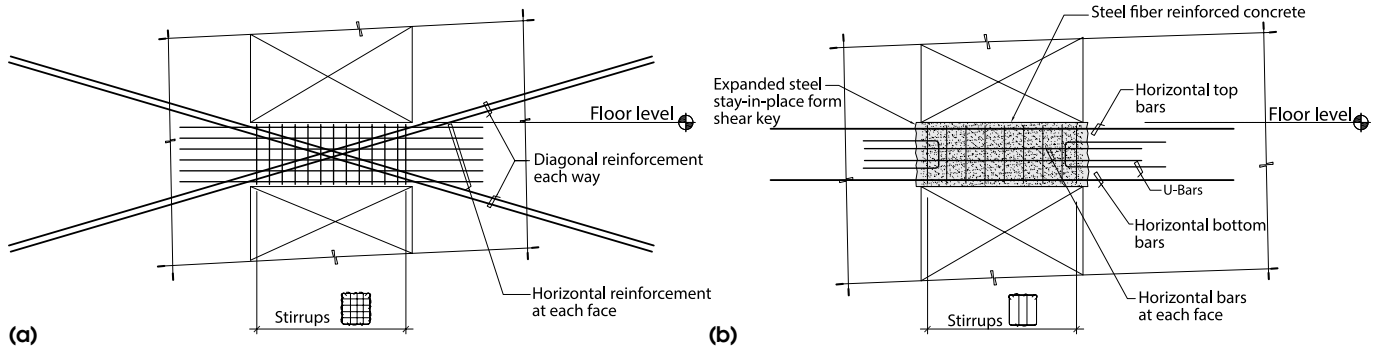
Schematics of link beams: (a) conventional reinforced concrete; and (b) fiber-reinforced concrete. A conventional link beam is typically highly congested and the extensions of the diagonal reinforcing bars will conflict with the adjacent wall reinforcing (yet to be placed). Fiber-reinforced concrete helps to eliminate much of the reinforcing needed in the beam, alleviating the congestion. In many cases, fiber-reinforced concrete will also help eliminate the diagonal extensions
